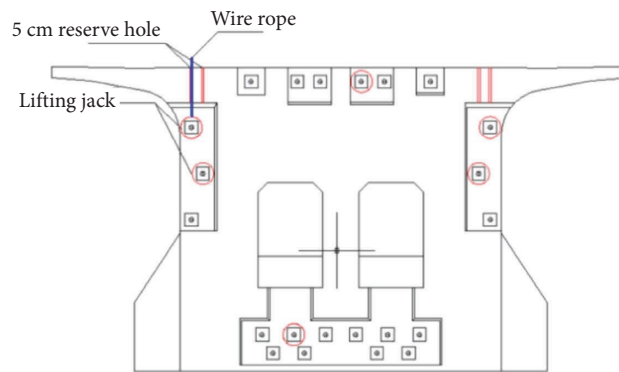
Layout of temporary prestressed tensioned jacks.
